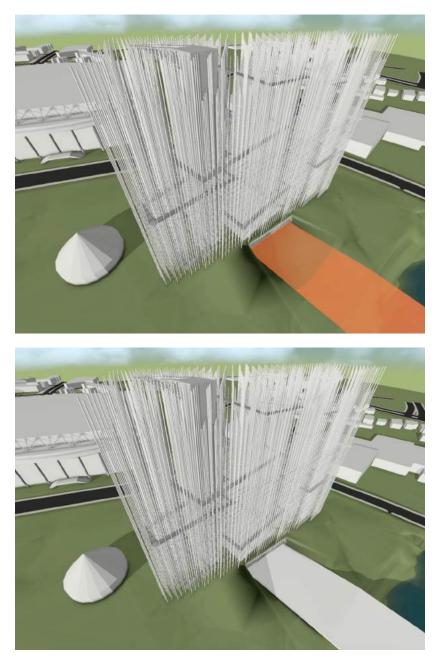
Cast in place entry ramp and final grading work can then proceed.
